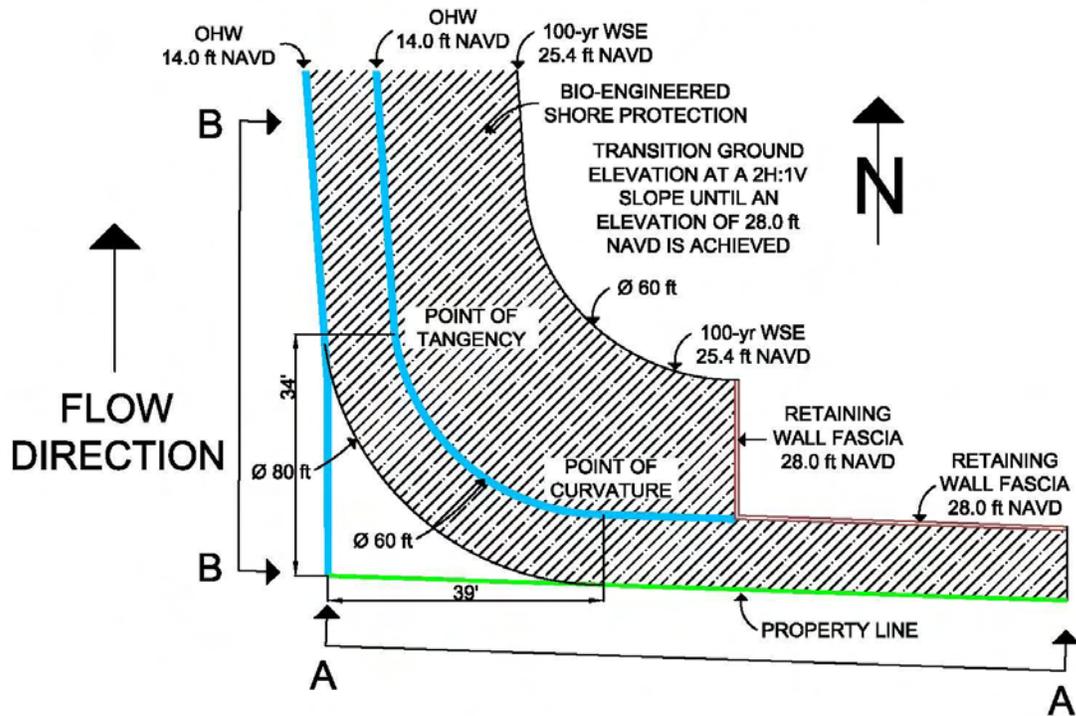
Bioengineered Shore-Protection Structure Detail with MSE Retaining Wall Set Back from Property Line – Southwest Corner
